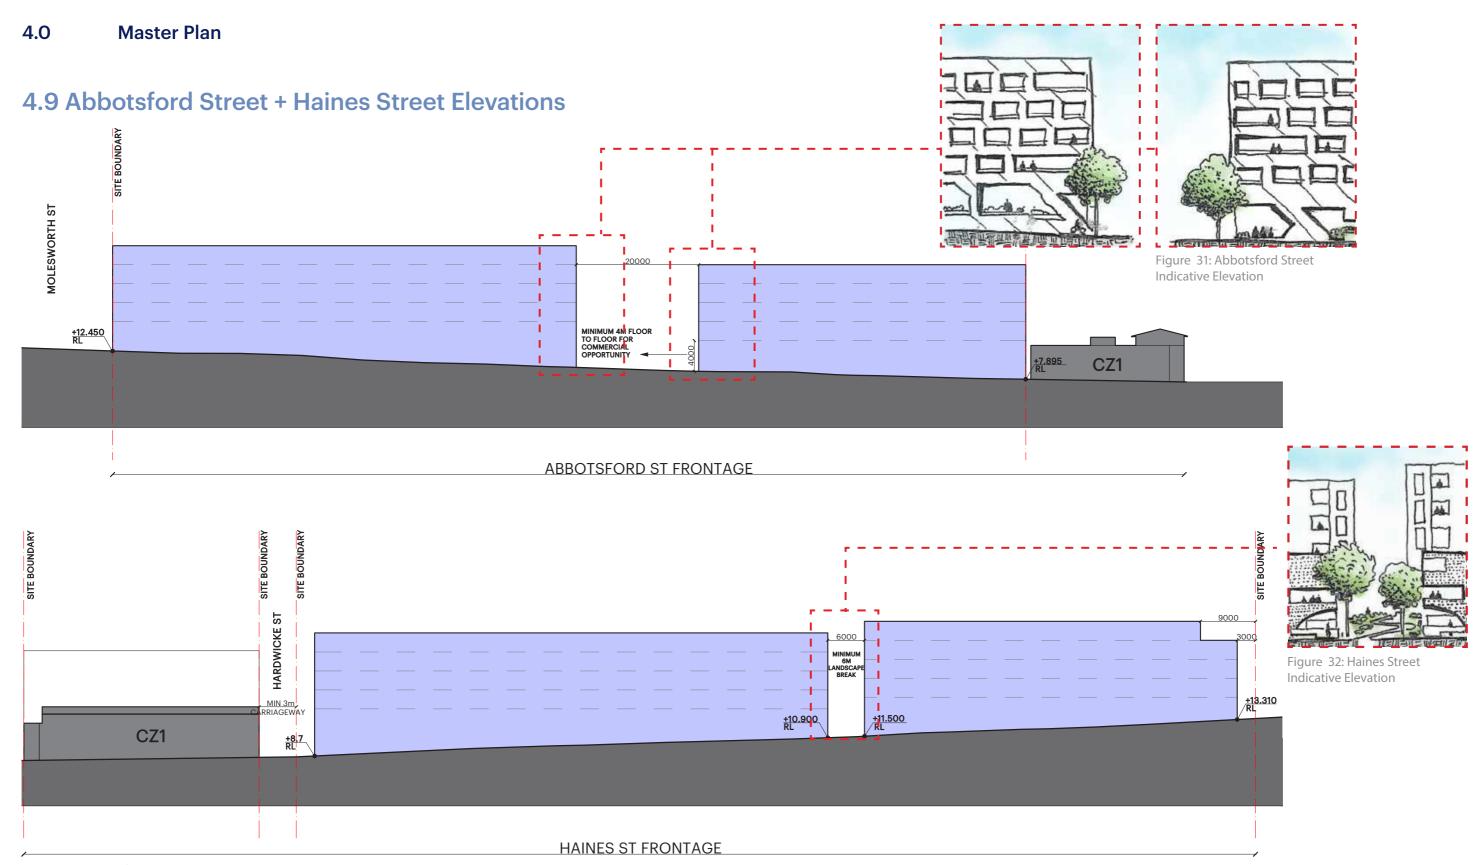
Abbotsford Street (top) and Haines Street (bottom) street elevations
